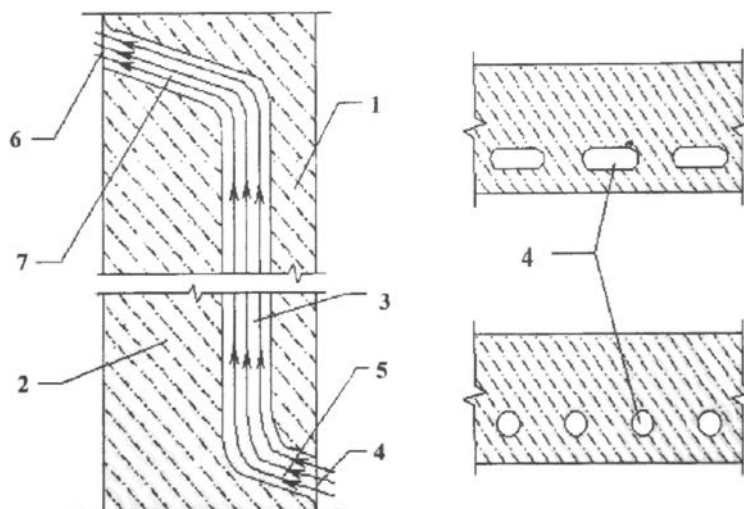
Single layer ventilated panel of external fences and natural with artificial (mechanical) ventilation: 1 - external protective and decorative screen 2 - internal bearing layer 3 - ducts, 4 - inlet openings 5 - inclined inlet area; 6 - outlet, 7 - sloping plot diverter.
